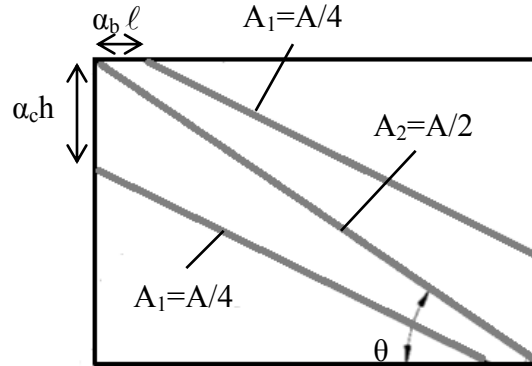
Proposed concrete masonry-infilled steel frame model
